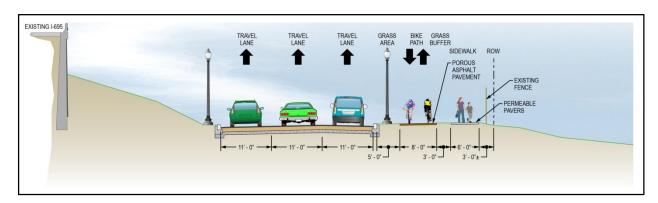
D Proposed Typical Section between 7th and 8th Streets
